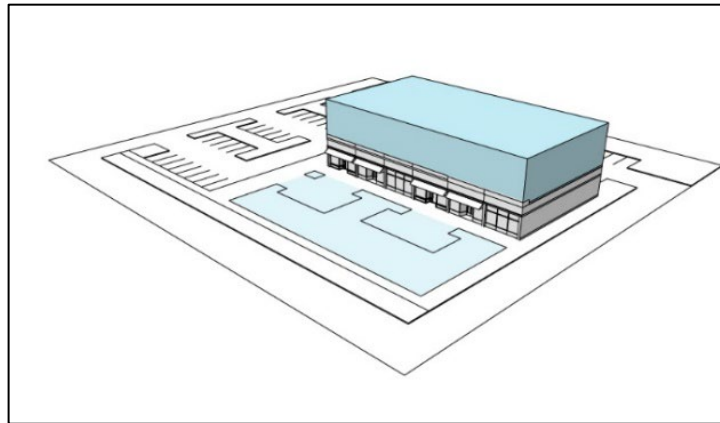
ADDITIONS TO EXISTING BUILDING IN THE MIX DISTRICT
